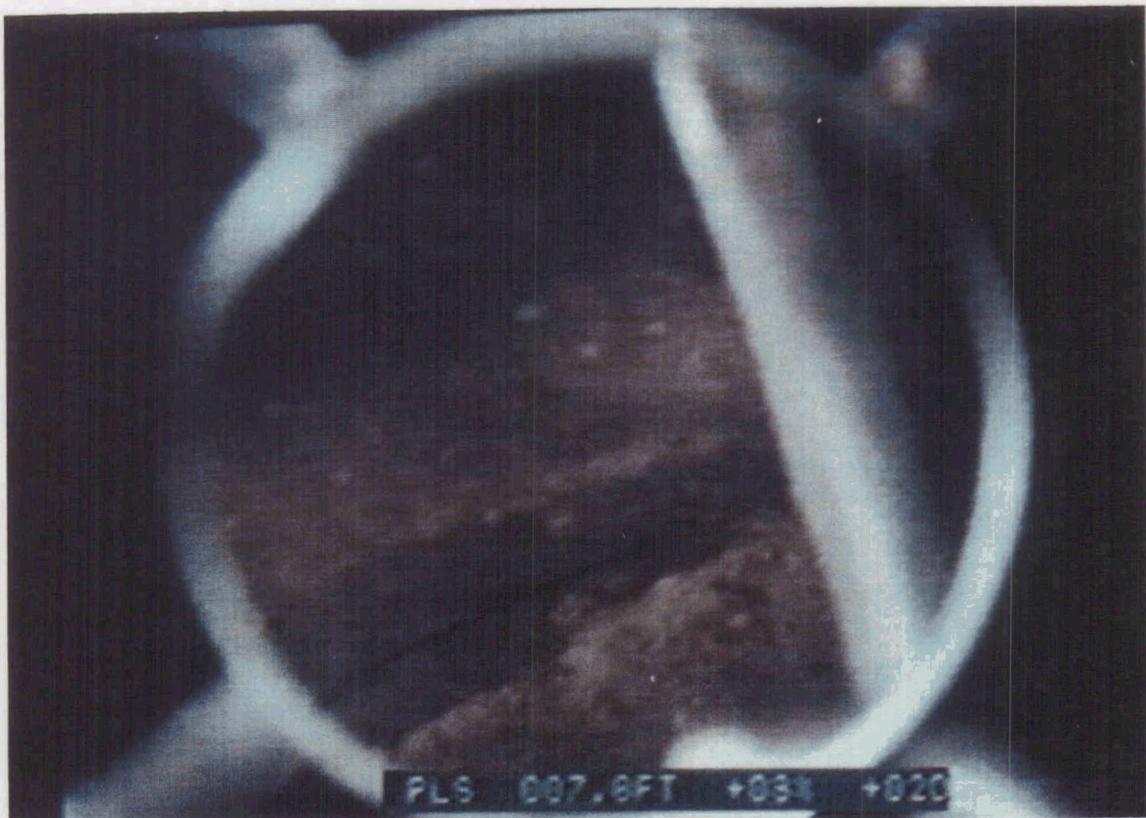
Spot where 2x4 was dragged on floor of section 3.
